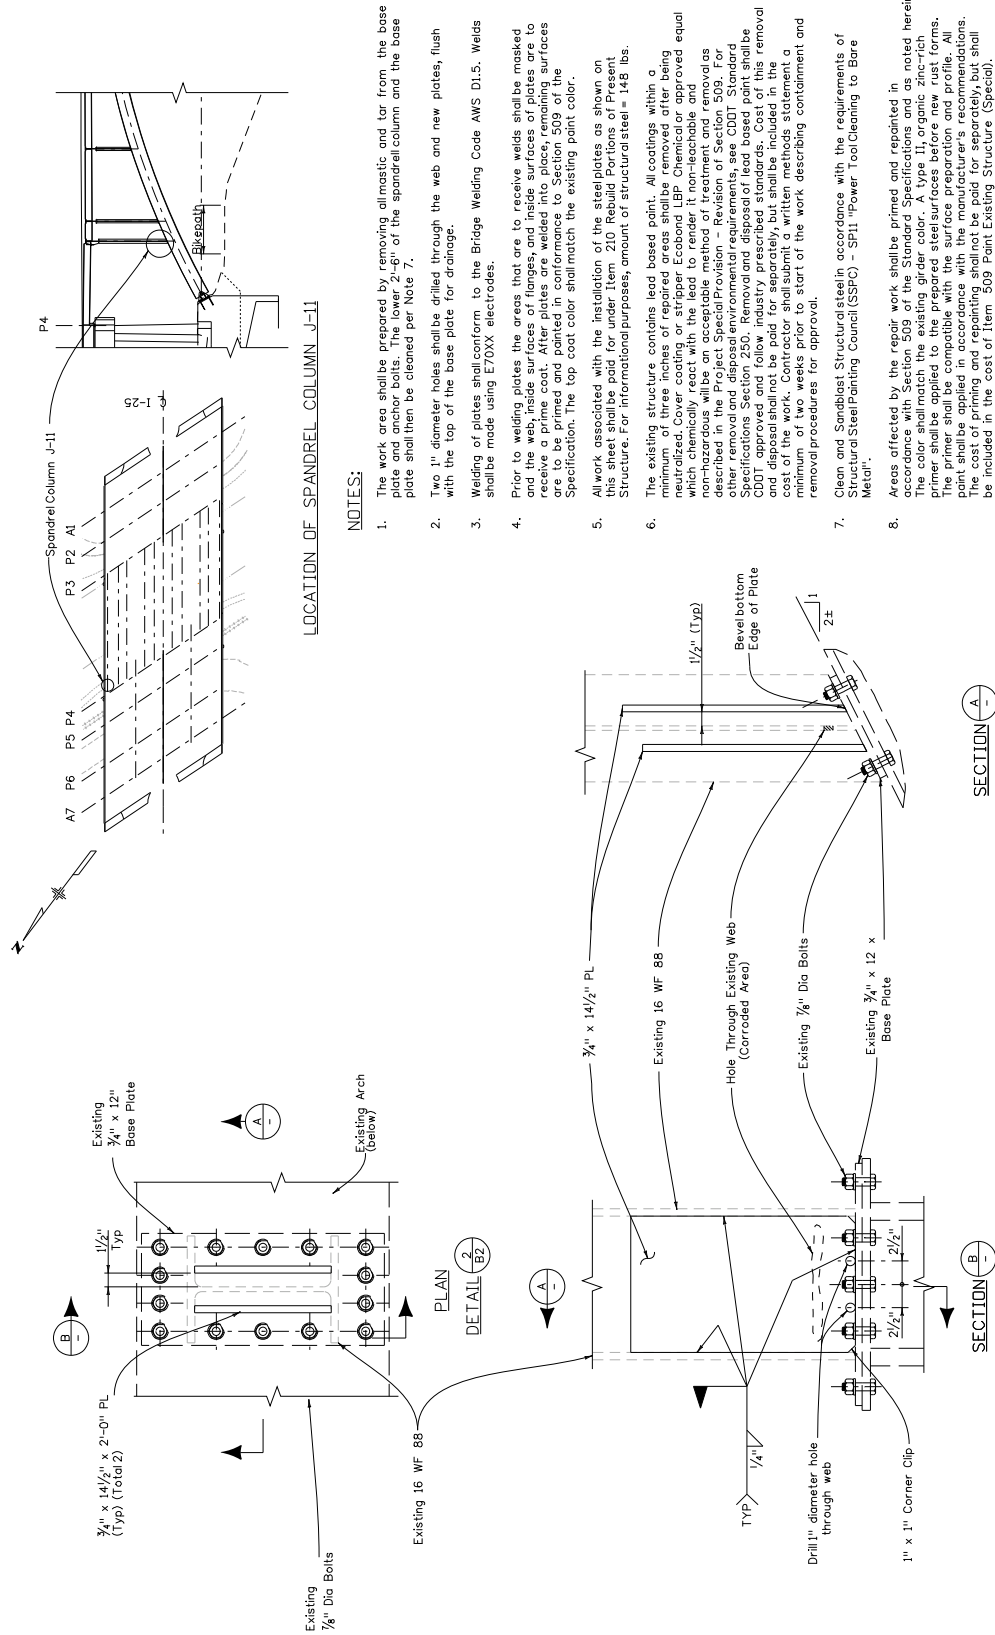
(K)-2 Sample Details for Repairing/Strengthening a Corroded column
